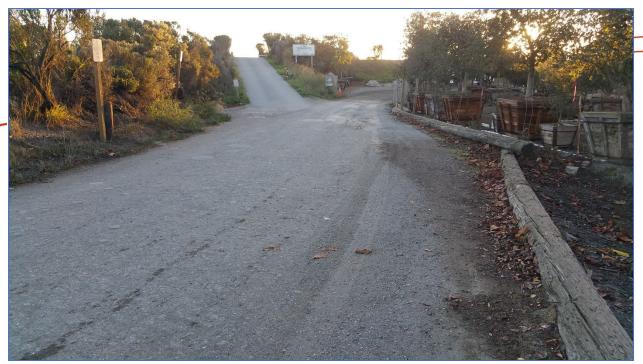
Train leading to the bridge over Stevens Creek, facing east
